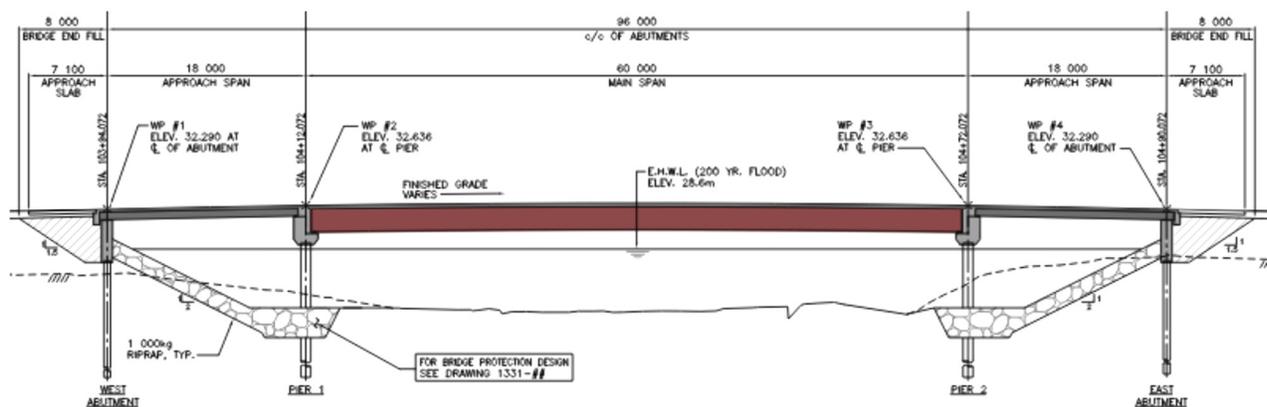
Original design concept: Composite steel plate girders in the main span and precast pretensioned concrete box girders for the approach spans [BC MoTI]
